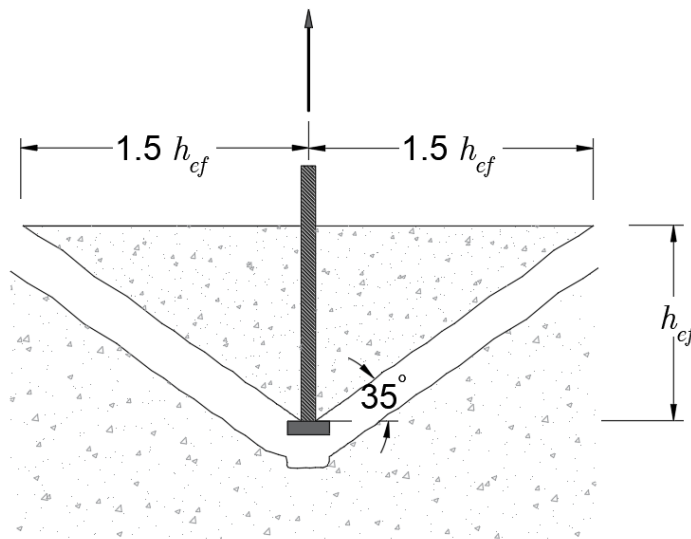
Concrete breakout failure (after ACI 318-19)
